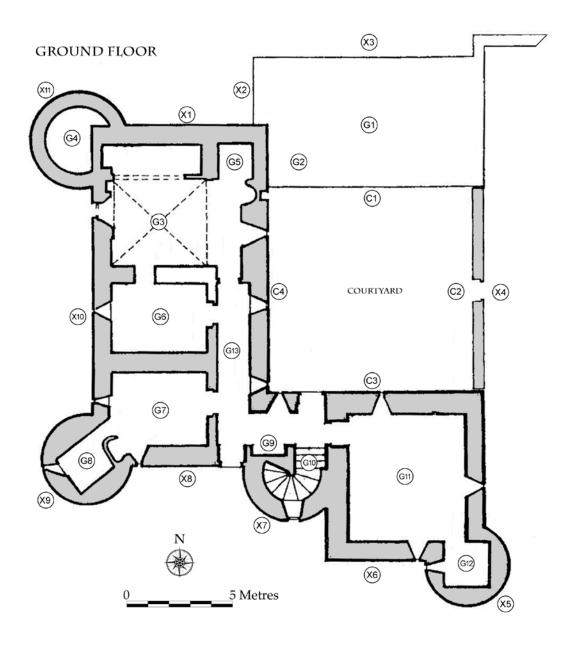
Ground Floor Components, Exterior Elevations and Courtyard Elevations
